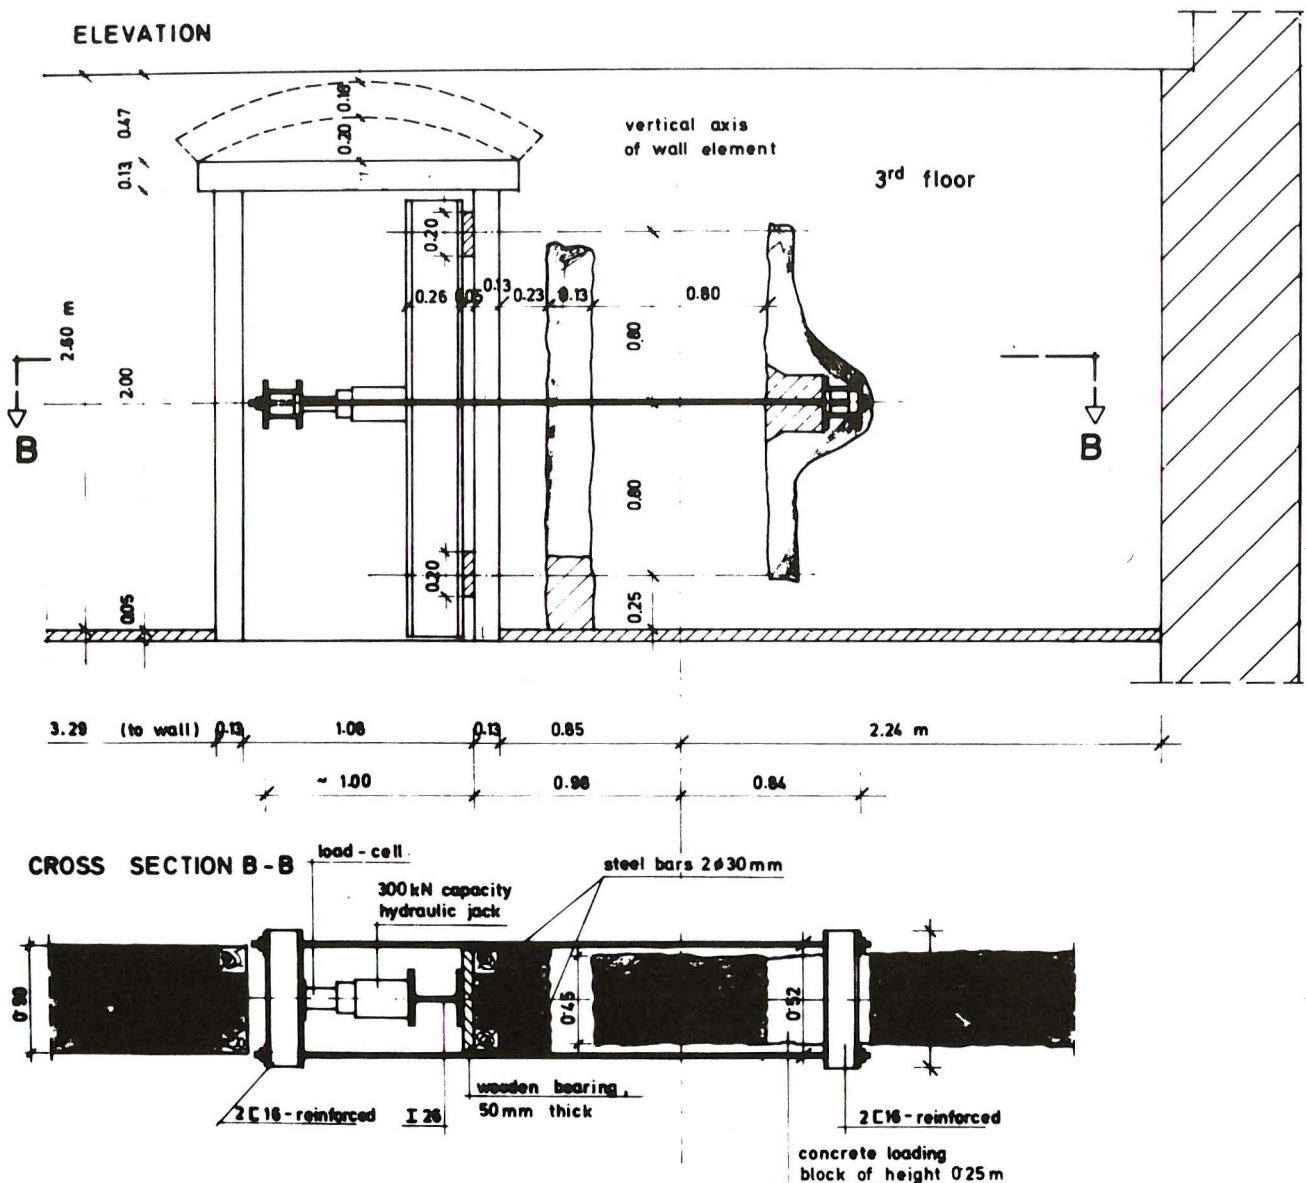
Set-up for carrying out in-situ test of stone-and-brick masonry wall element.
